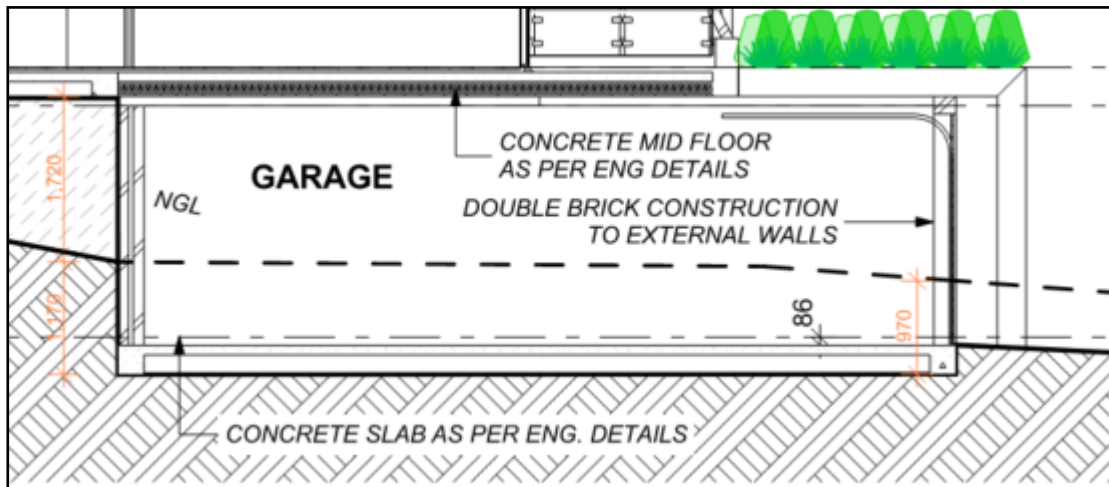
Cut required to facilitate the ground level of the garage (Source: Prime Design)
